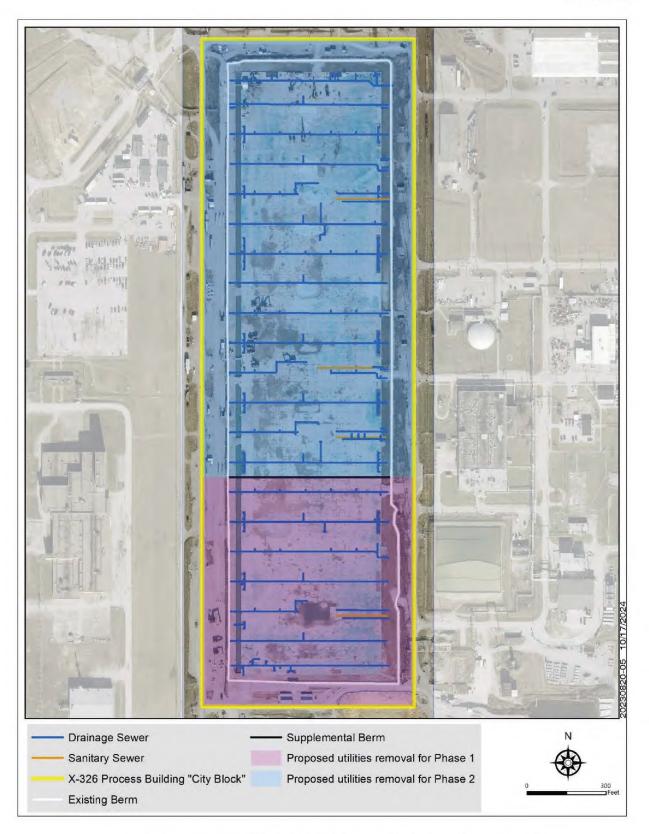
Underground Utilities – Drain Lines Under the Concrete Slab
